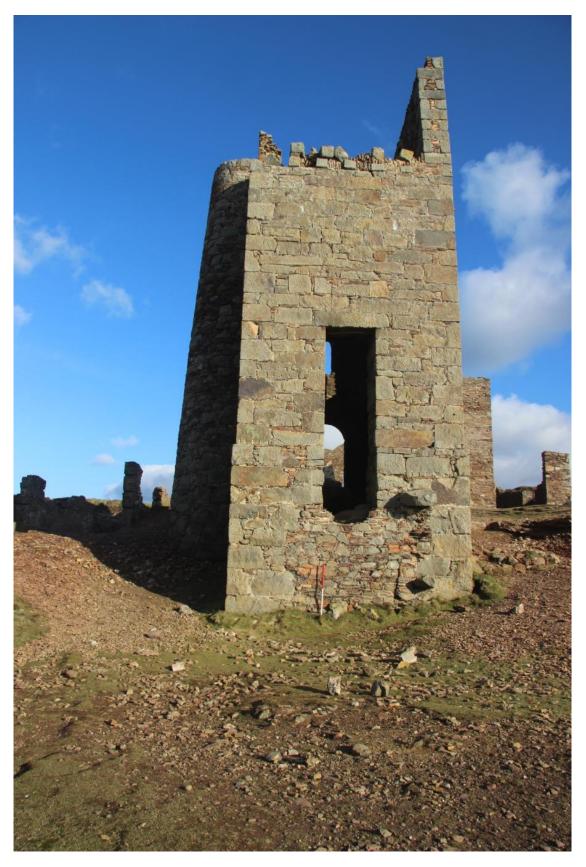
The western elevation of the stamps engine house showing the infill of the scar left when the flywheel loadings were removed and the consolidated collapsed wing way masonry on the head of the bob wall.
